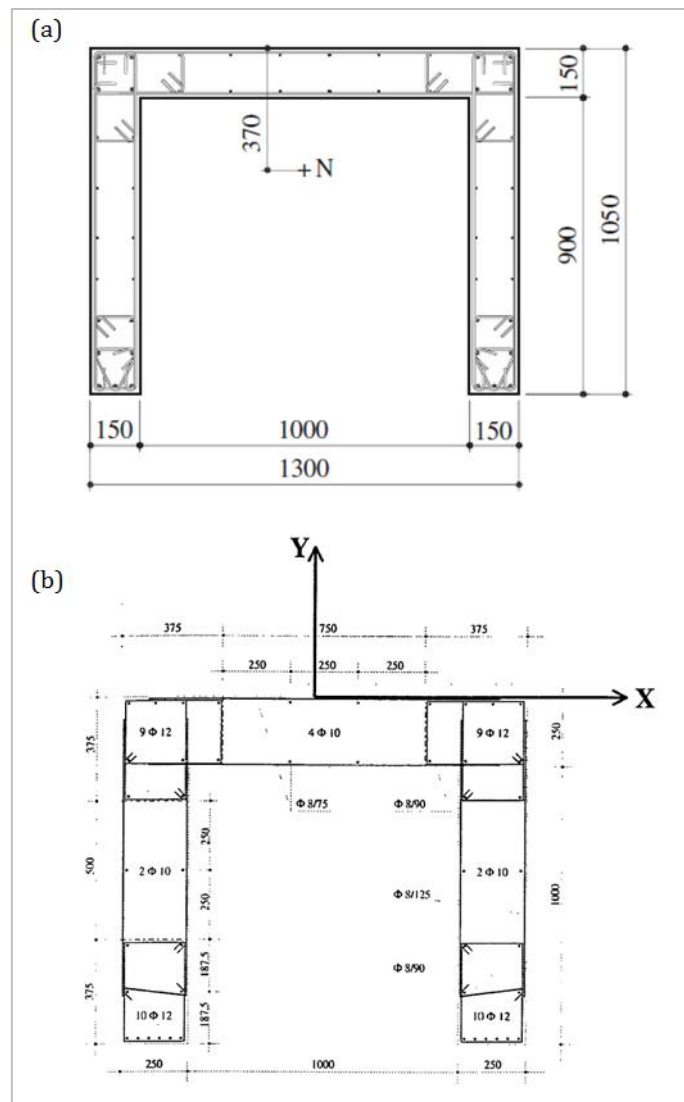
Cross-section of wall specimen tested by: (a) Beyer et al., (2008b) specimen TUA, (b) Ile and Reynouard (2005)
